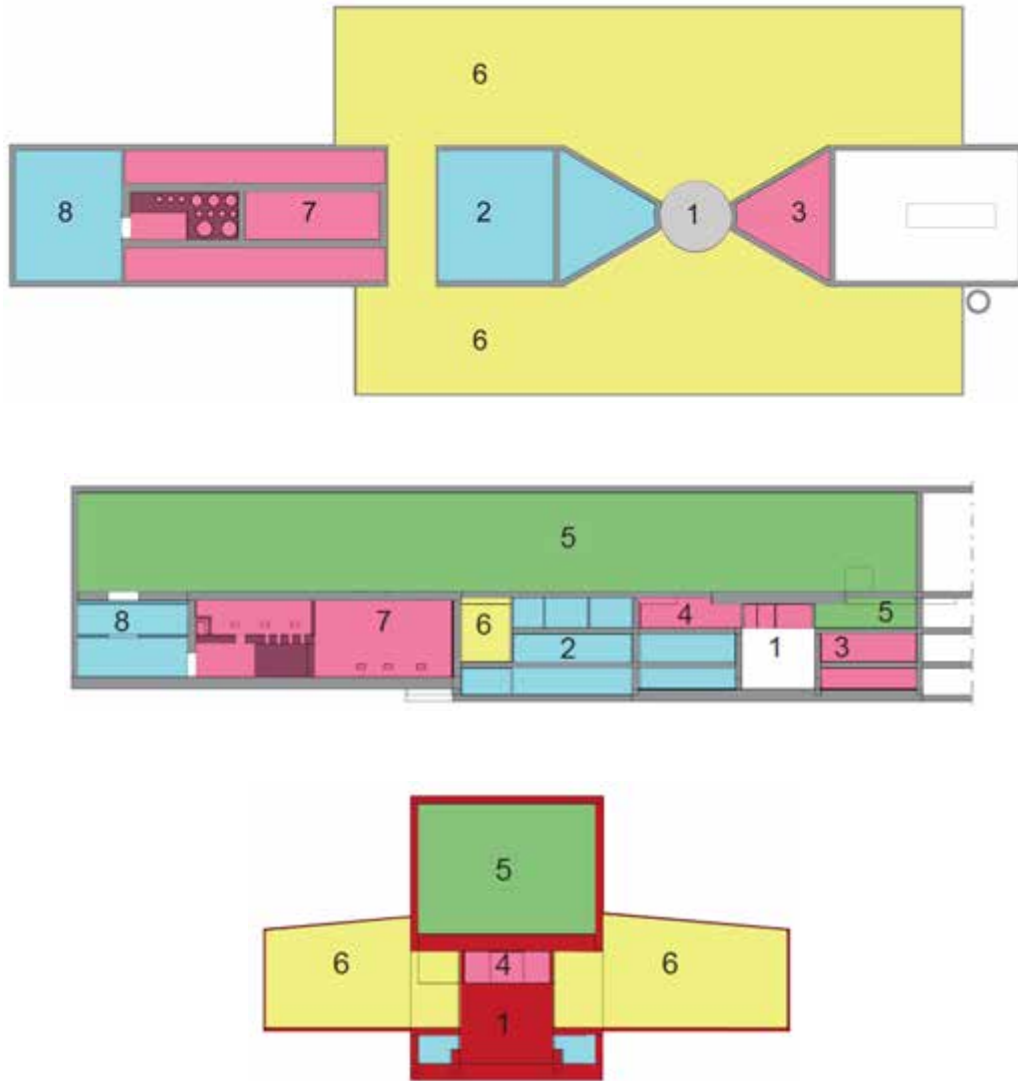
Target station building. Top: Plan view at the proton beam elevation. Middle: Side view along the proton beam. Bottom: Side view facing upstream.
